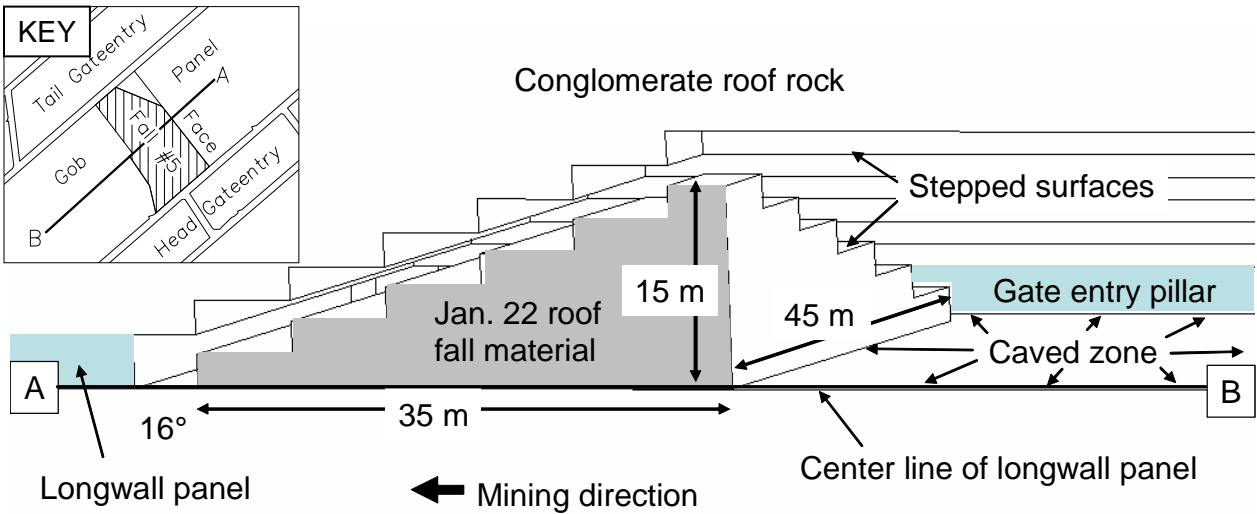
Generalized sketch of the Jan. 22 roof fall (Fall No. 5), longwall panel No.1, Moonee Colliery.
